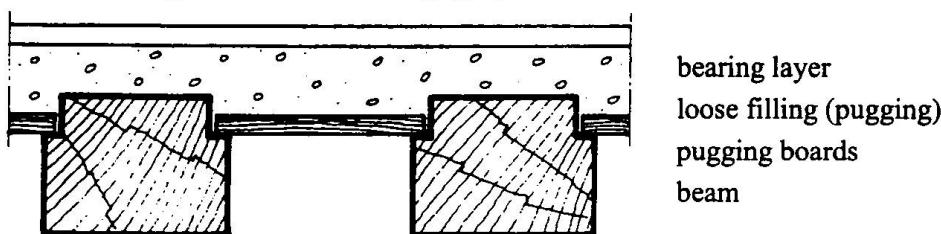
'Salzburger Decke' - 'Salzburg-type floor'
